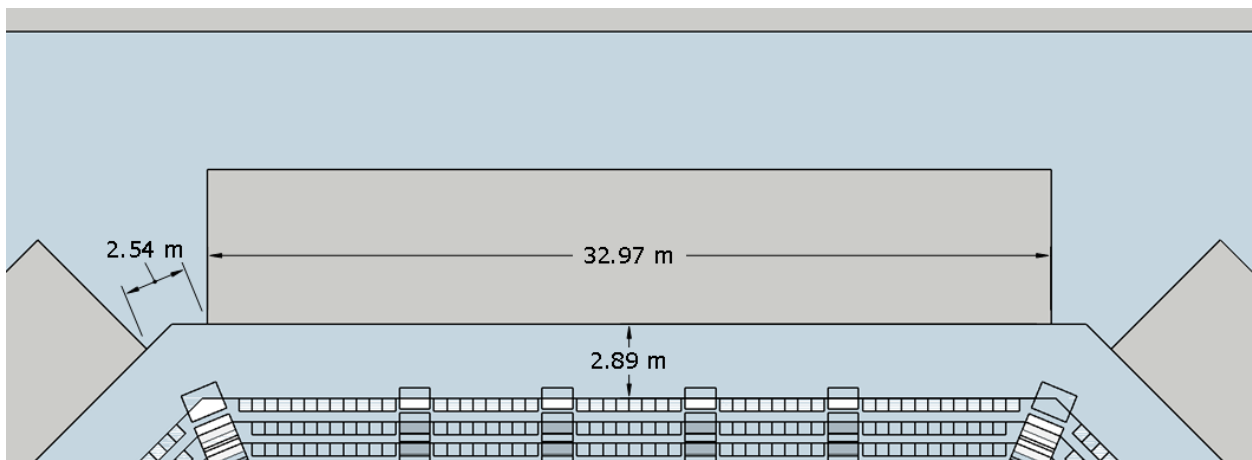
Dimensions of walkways and gates, taken from proprietary CAD drawings of York University Stadium
